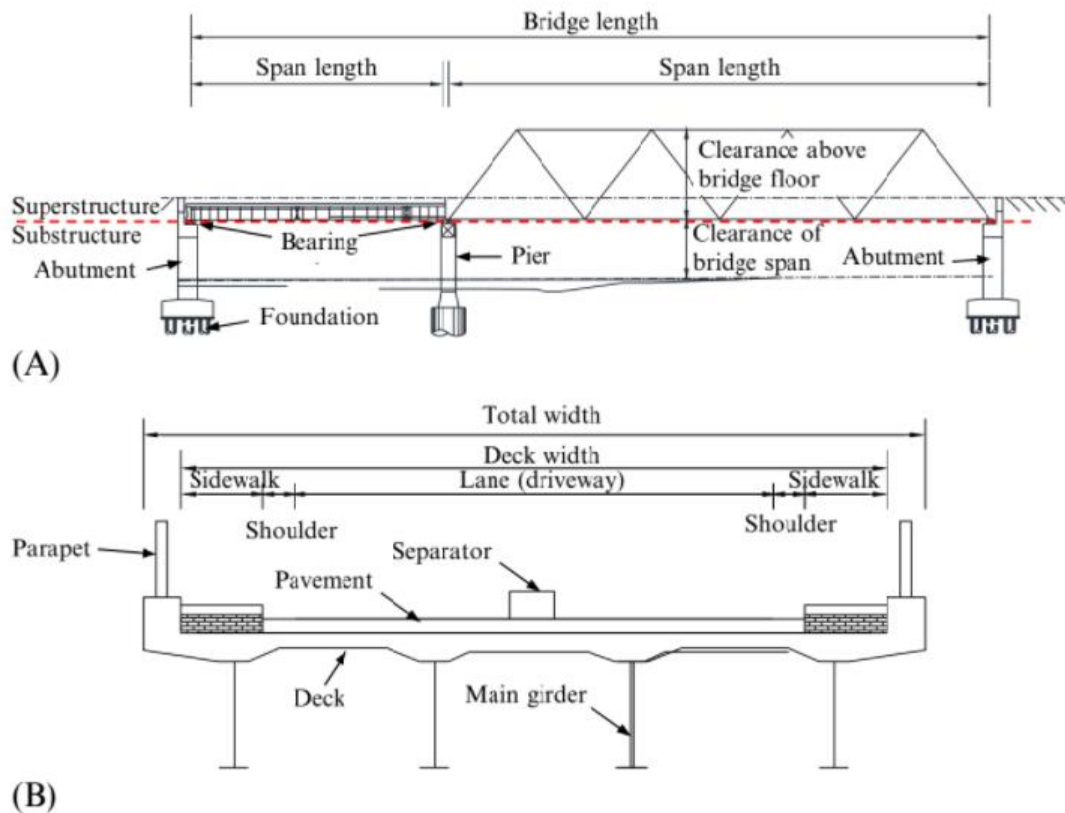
General terminology of bridges. (A) Longitudinal direction. (B) Cross section.
